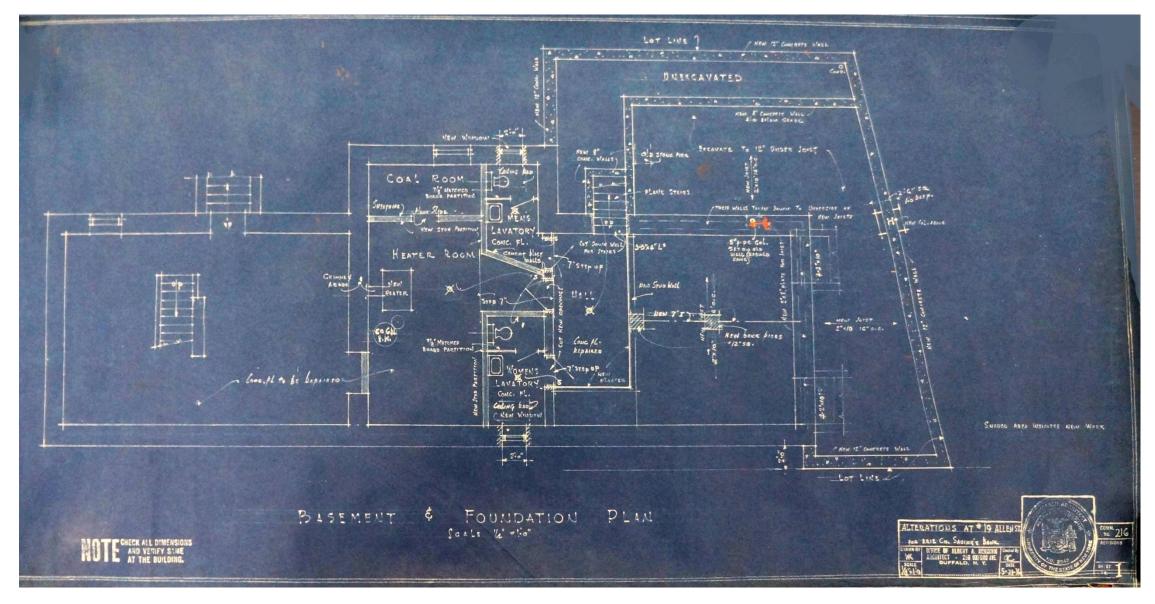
19 Allen Street, foundation plan, 1936. City of Buffalo.
